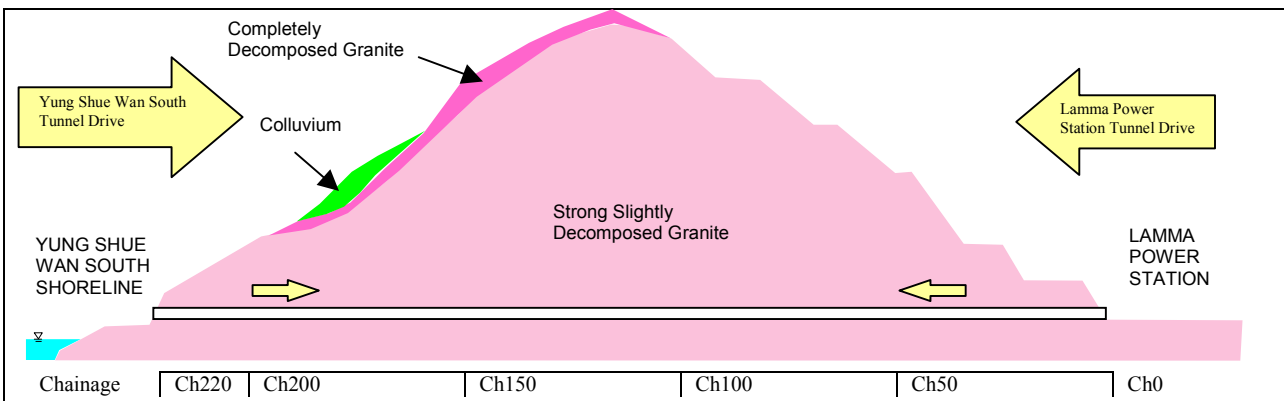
Longitudinal Section of the 275kV Cable Tunnel
